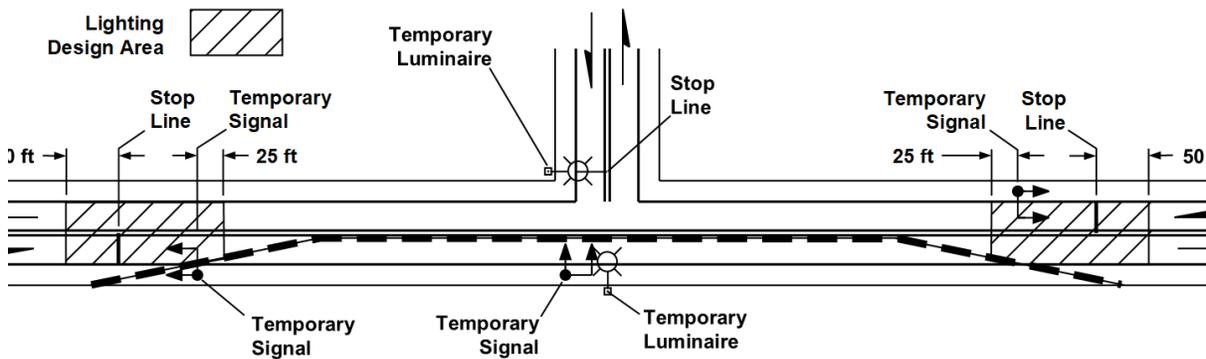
Barrier Constrained Roadway Lighting Design Areas
